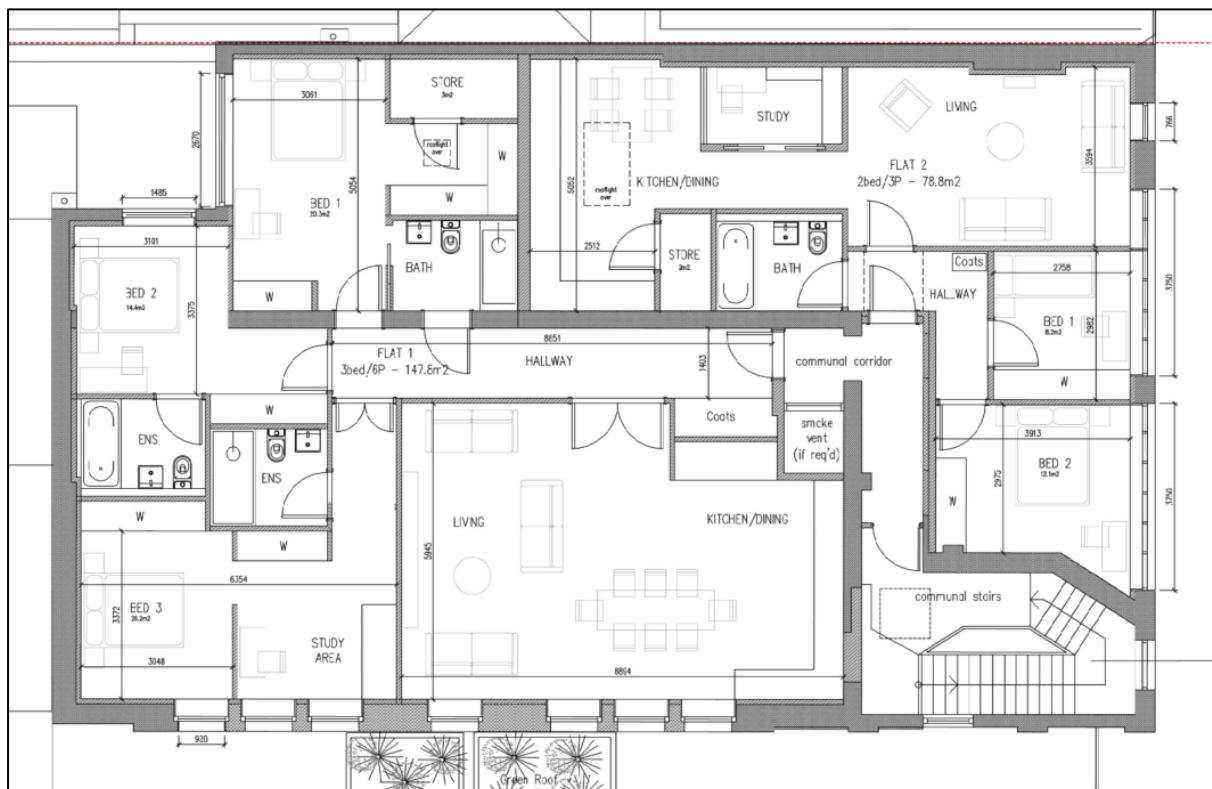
Proposed first floor plan, showing two self-contained residential units.
